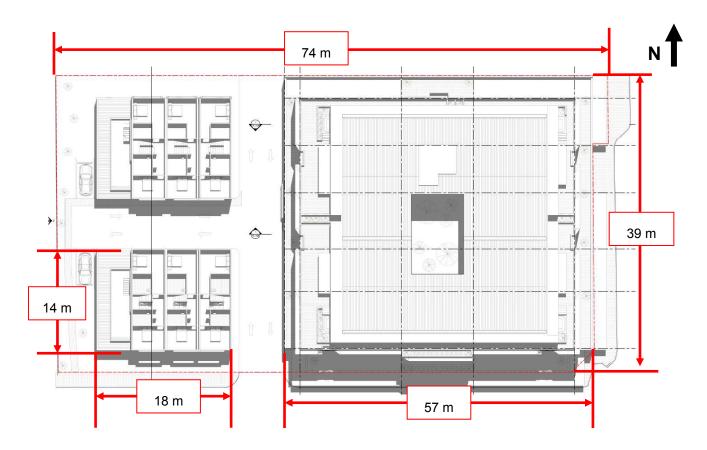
Existing ground floor plan of 248 Unley Road, Hyde Park, South Australia
